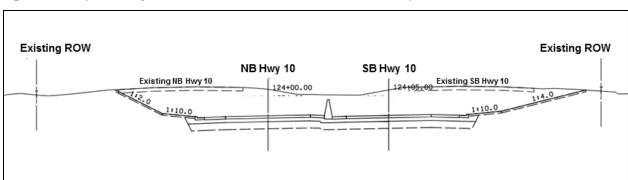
Proposed Hwy 10 Cross Section South of 4^{th} Street SE Overpass
